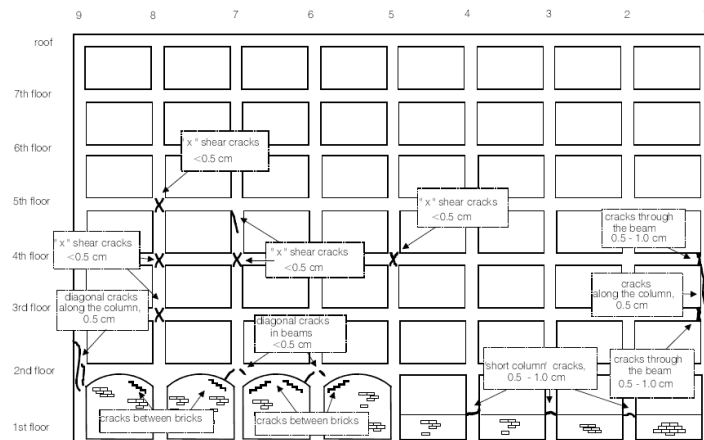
Structural damages on the North D facade of the Van Nuys Building, after Northridge earthquake, detected by Trifunac et al. in the survey of 04/02/1994
